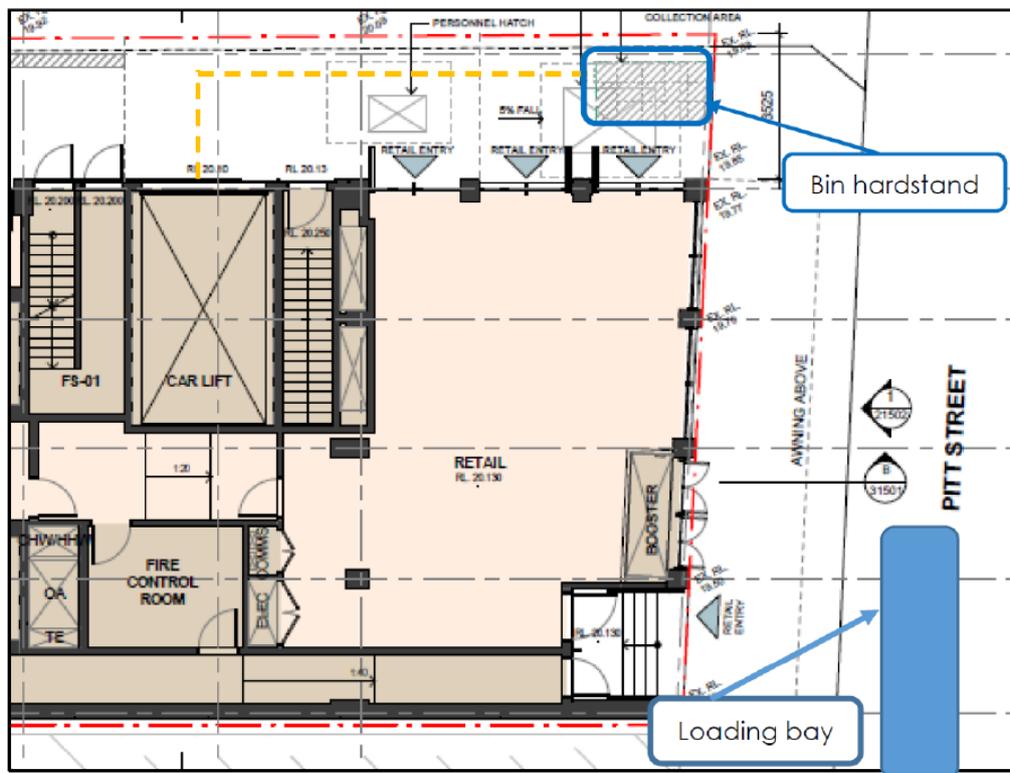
Proposed waste collection arrangement, with bin hardstand area and existing loading zone labelled
